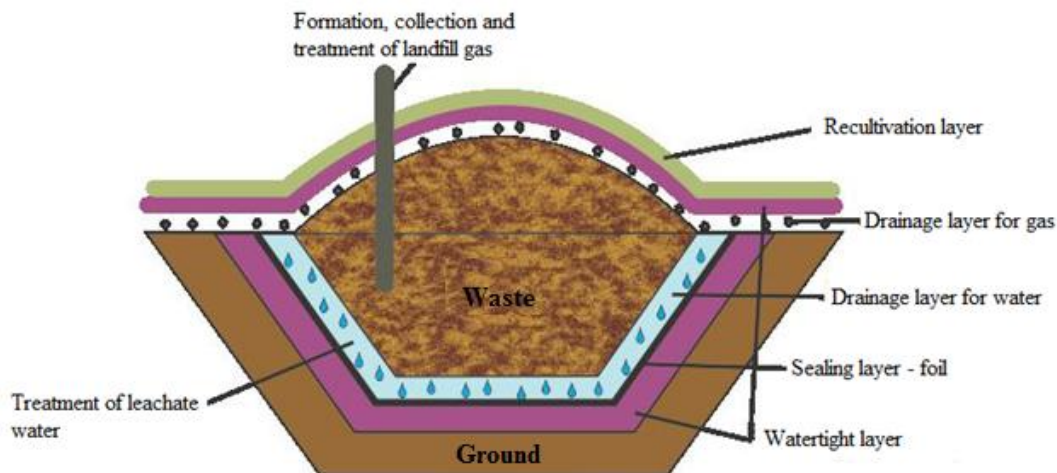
Layout of the landfill with the collection system for leachate waters [1]
